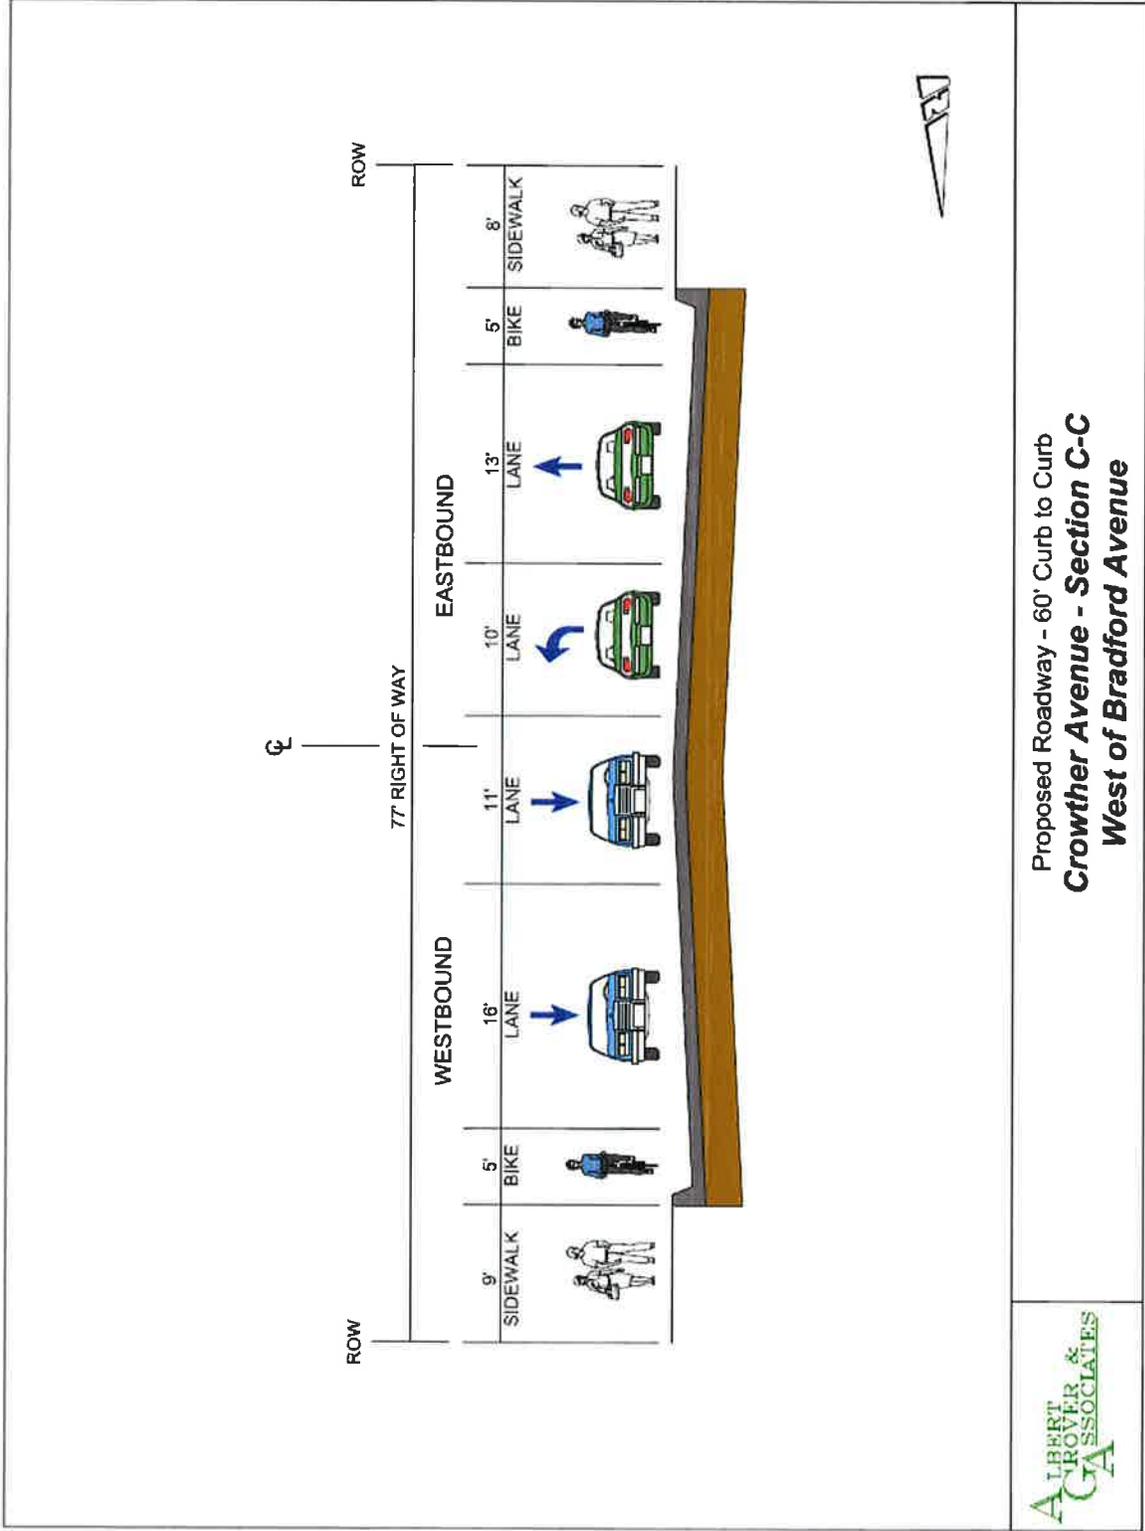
CROWTHER AVENUE CROSS SECTIONS - West To Bradford Ave
